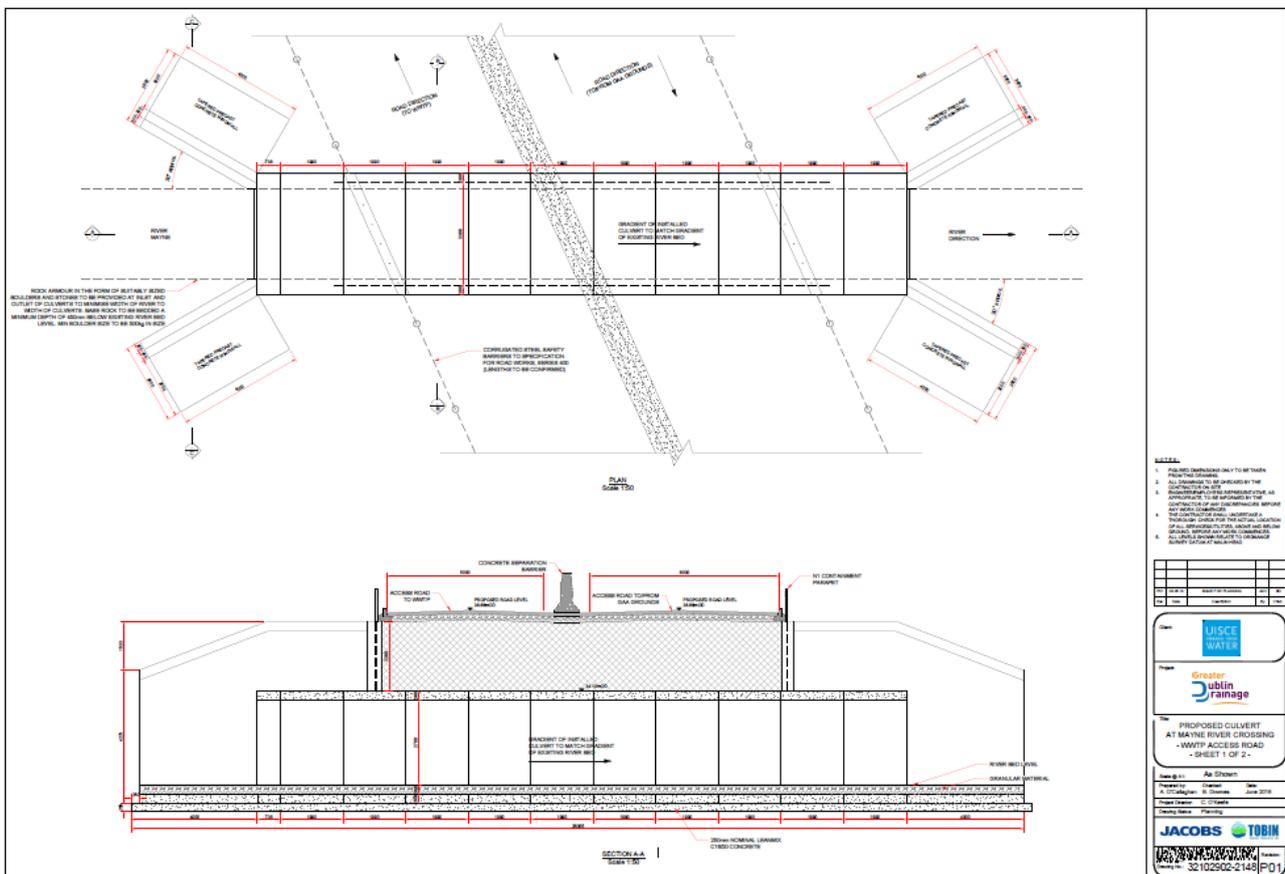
Extract from drawing 32102902-1067 showing extent of culvert.
